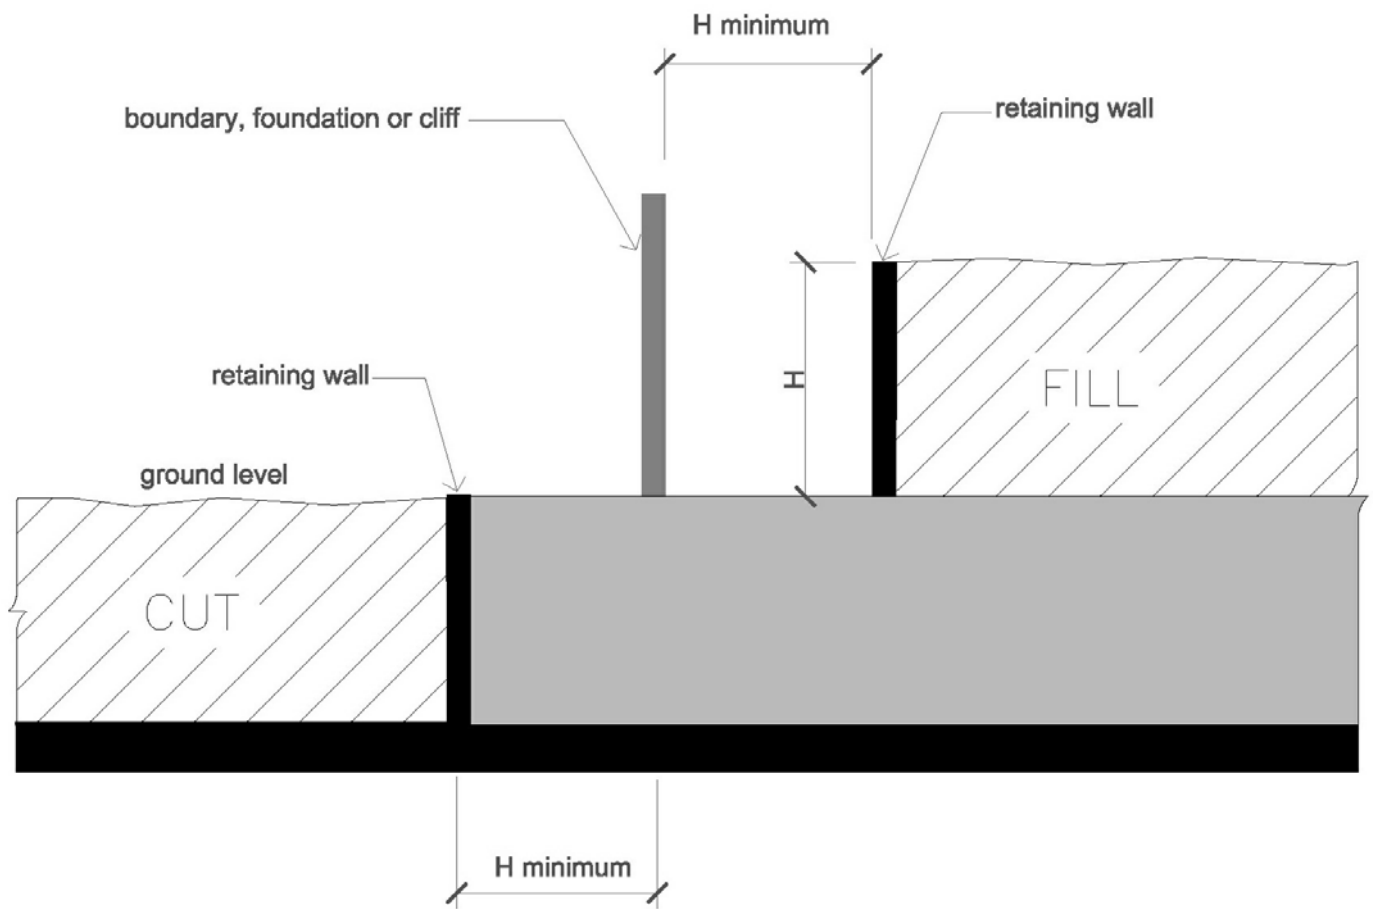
A.5.4B: Cut and fill supported by retaining walls (elevation view)
